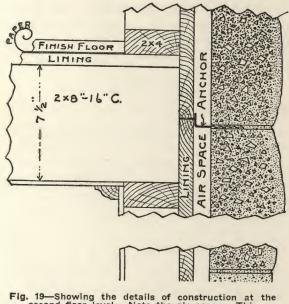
Showing the details of construction at the second floor level. Note the air space. This detail provides also for an anchored wall.
